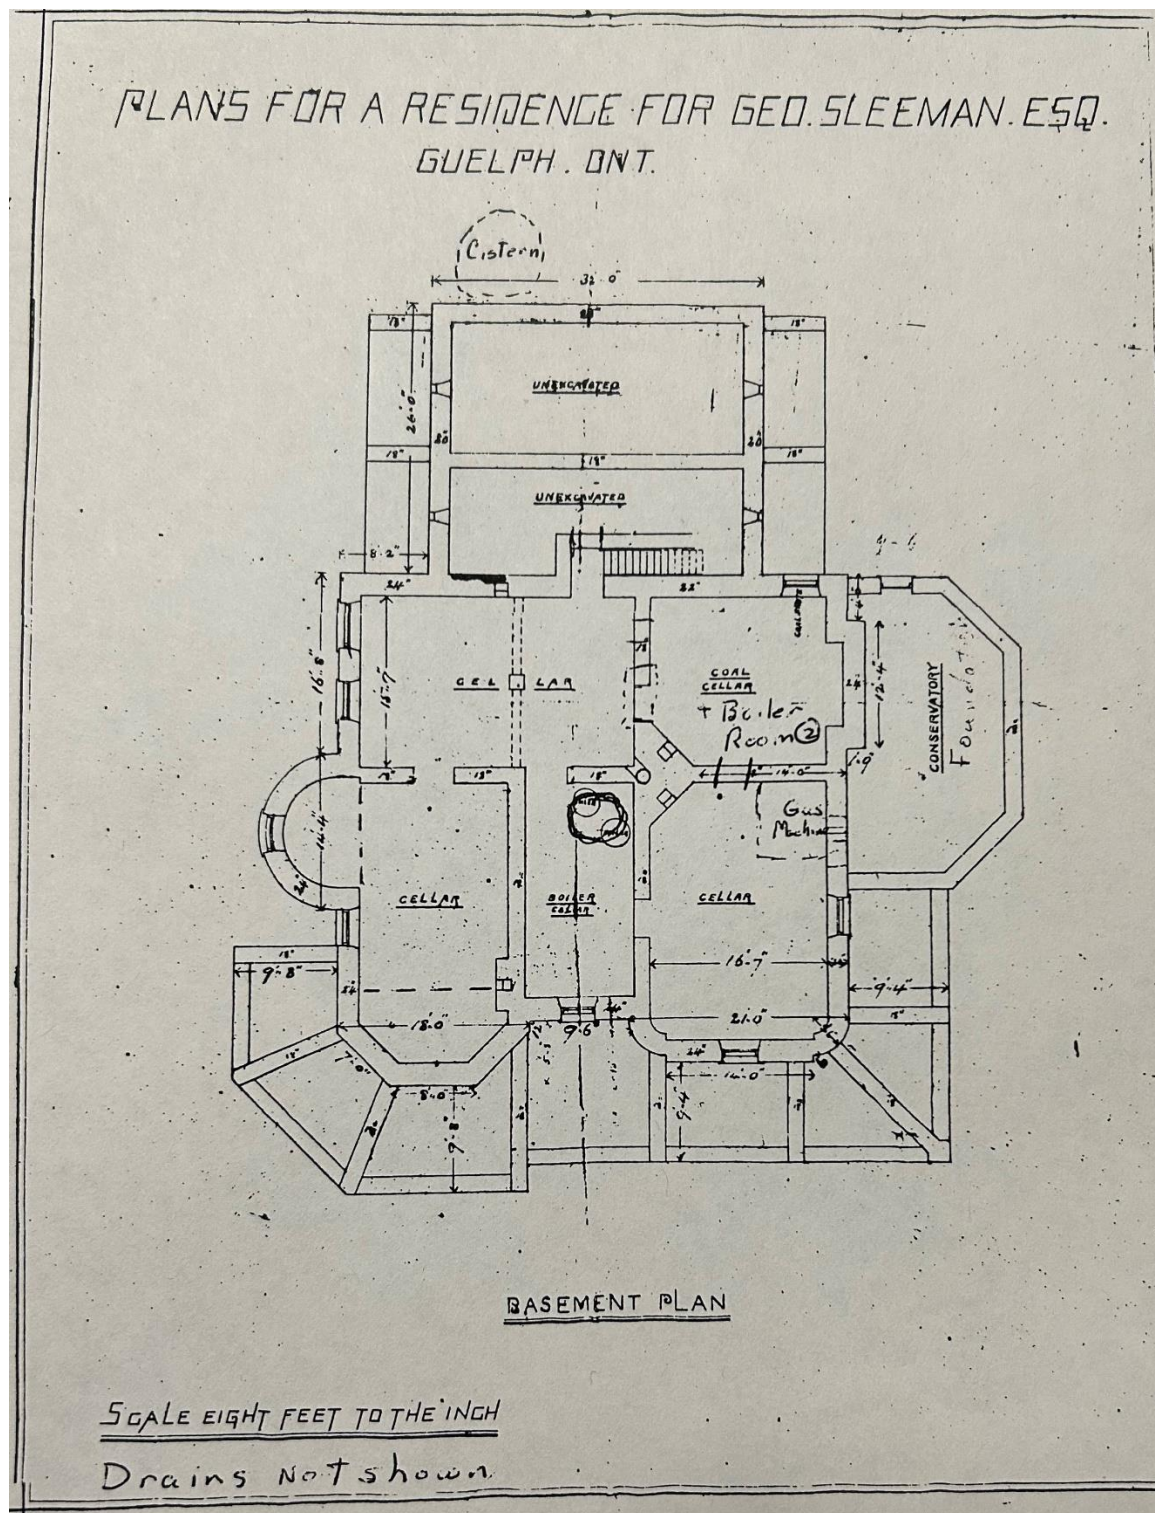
Floor plan of the basement of the Sleeman House (Sleeman Collection, McLaughlin Library Archive & Special Collections).
